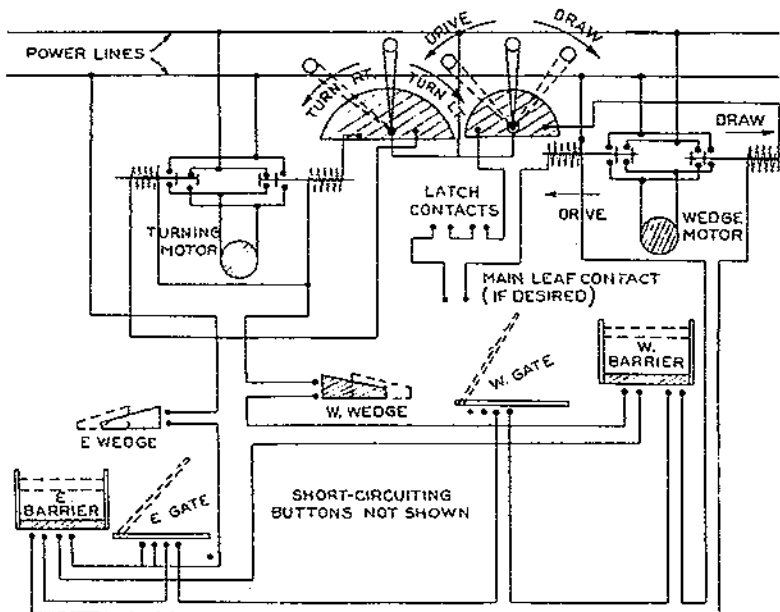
Interlocking devices controlling wedge motor and turning motor
